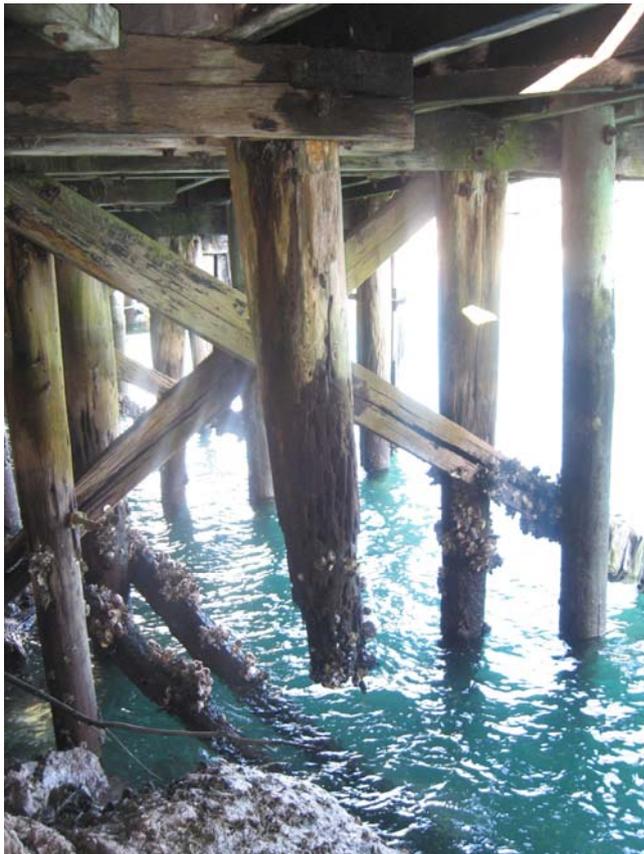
Badly decayed horizontal timber post in fender system. Also bad decay in left hand fender system timber pile.
